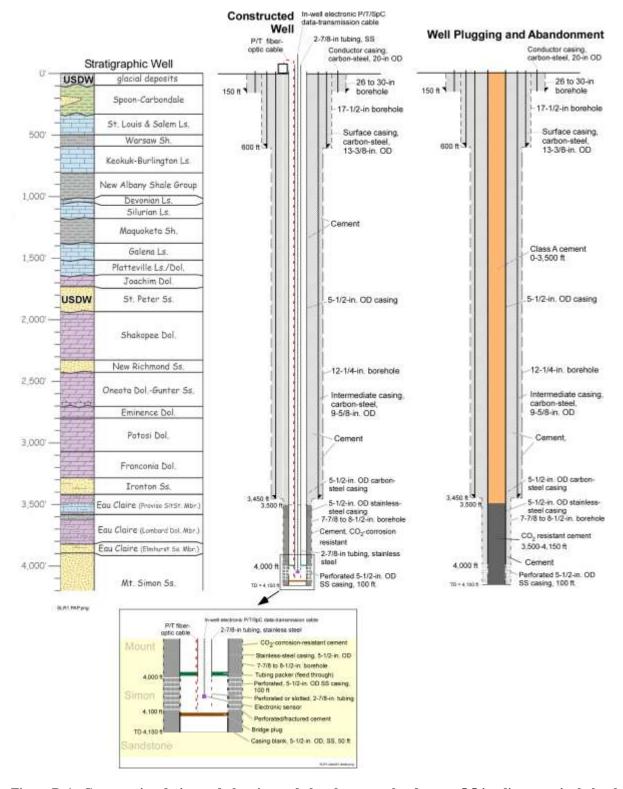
Construction design and plugging and abandonment plan for new 5.5-in.-diameter single-level in-reservoir monitoring well.
